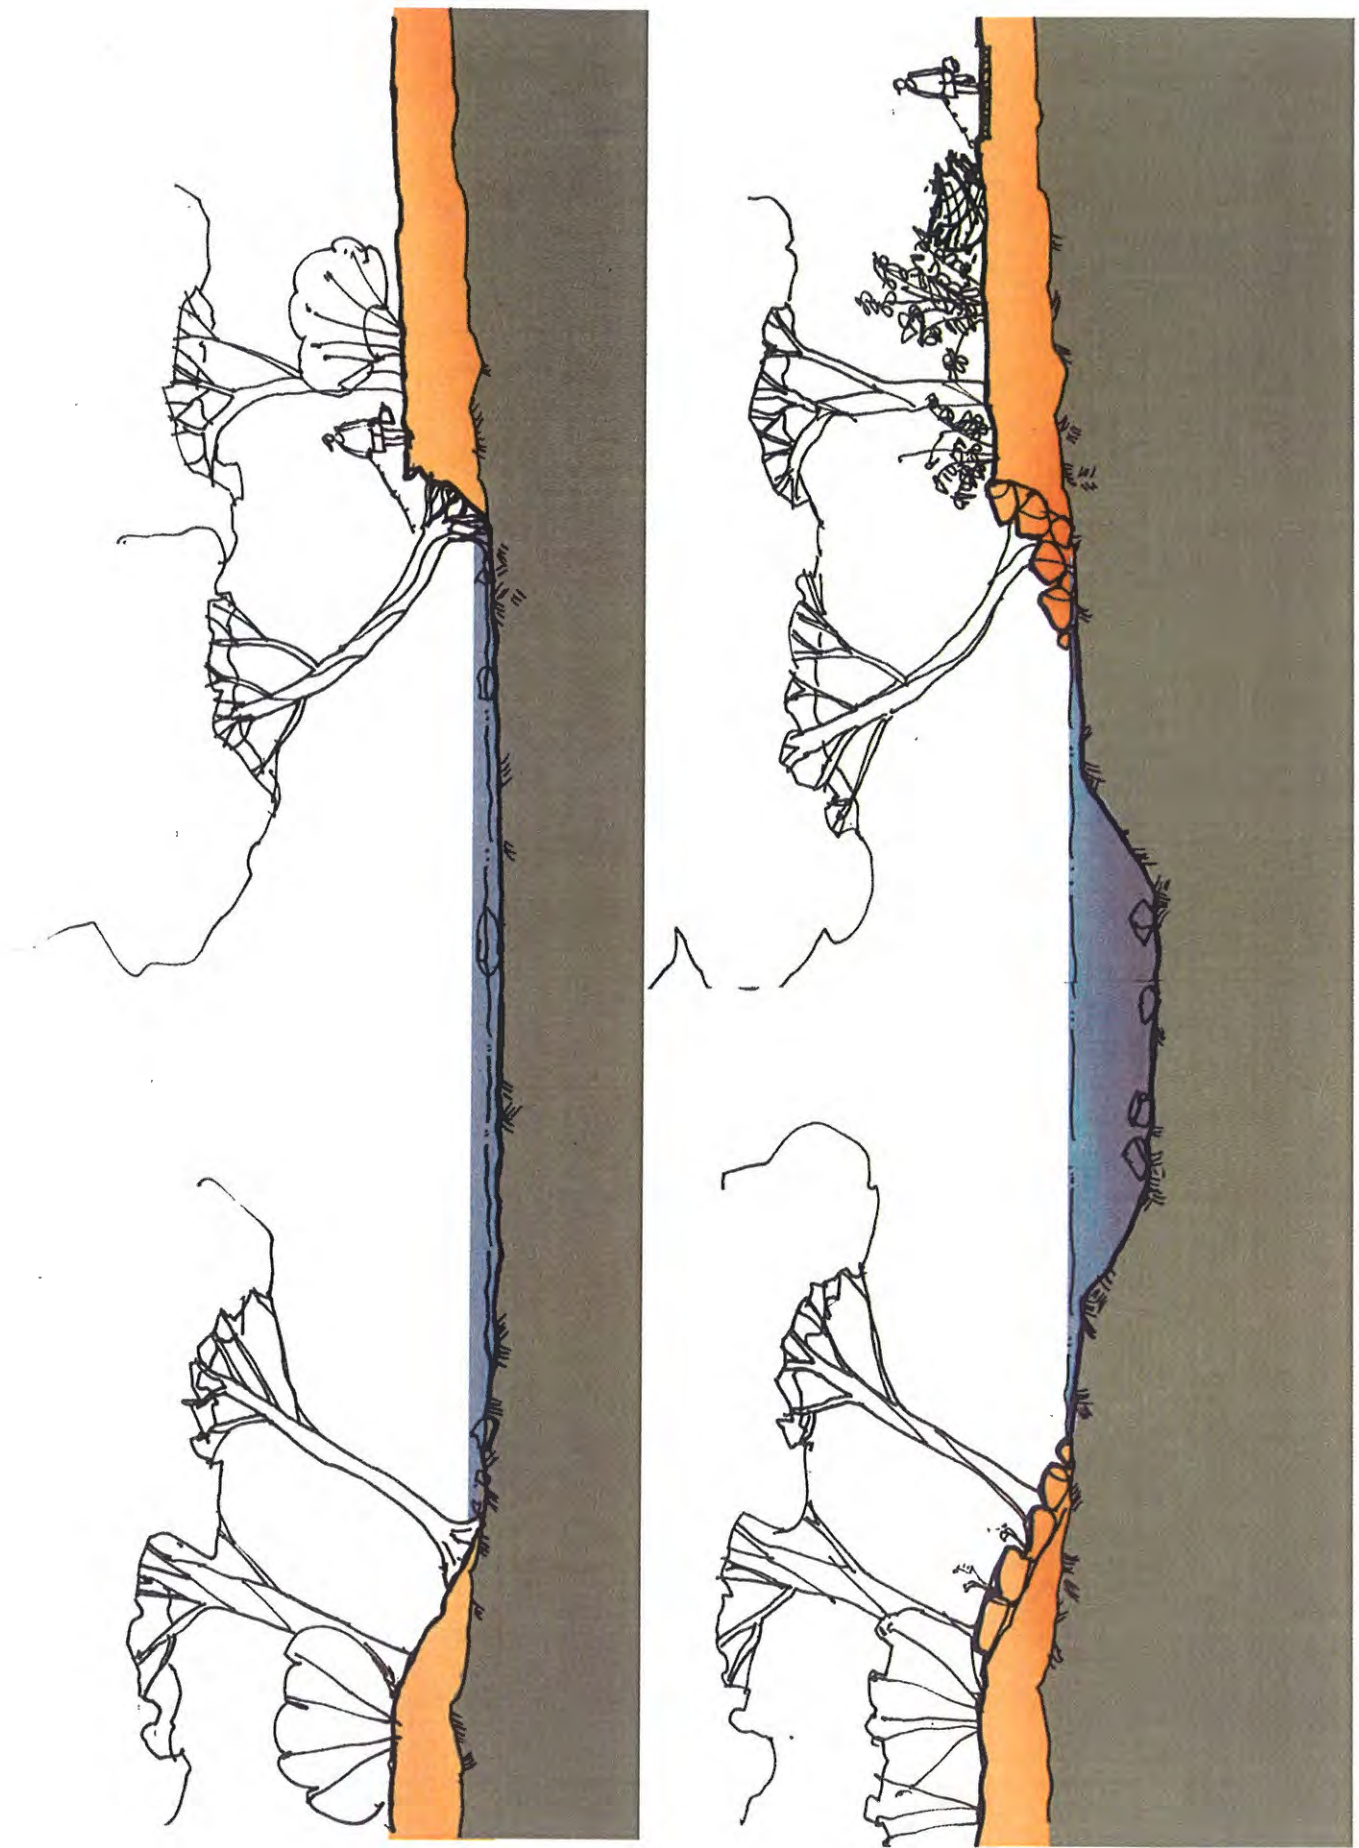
EXISTING AND PROPOSED CHANNEL CROSS SECTIONS
